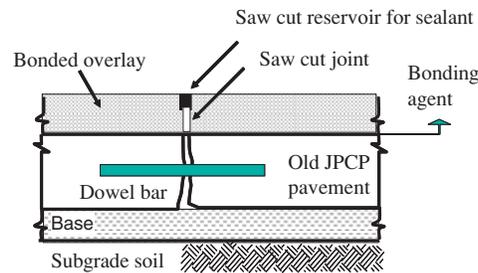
Cross section of bonded overlay of jointed plain concrete pavement
